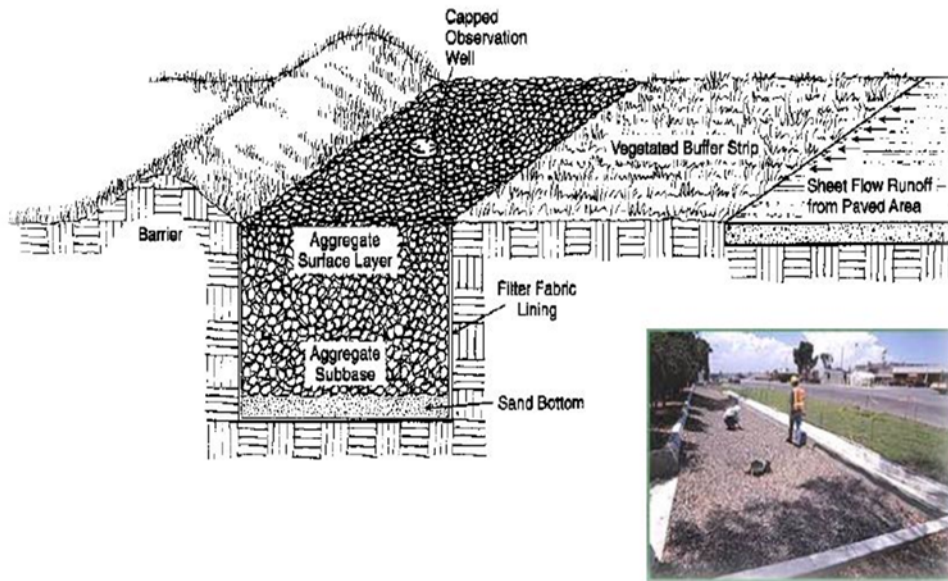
Cross section of a generic infiltration trench. (Figure from Georgia Stormwater Manual Volume 2).
